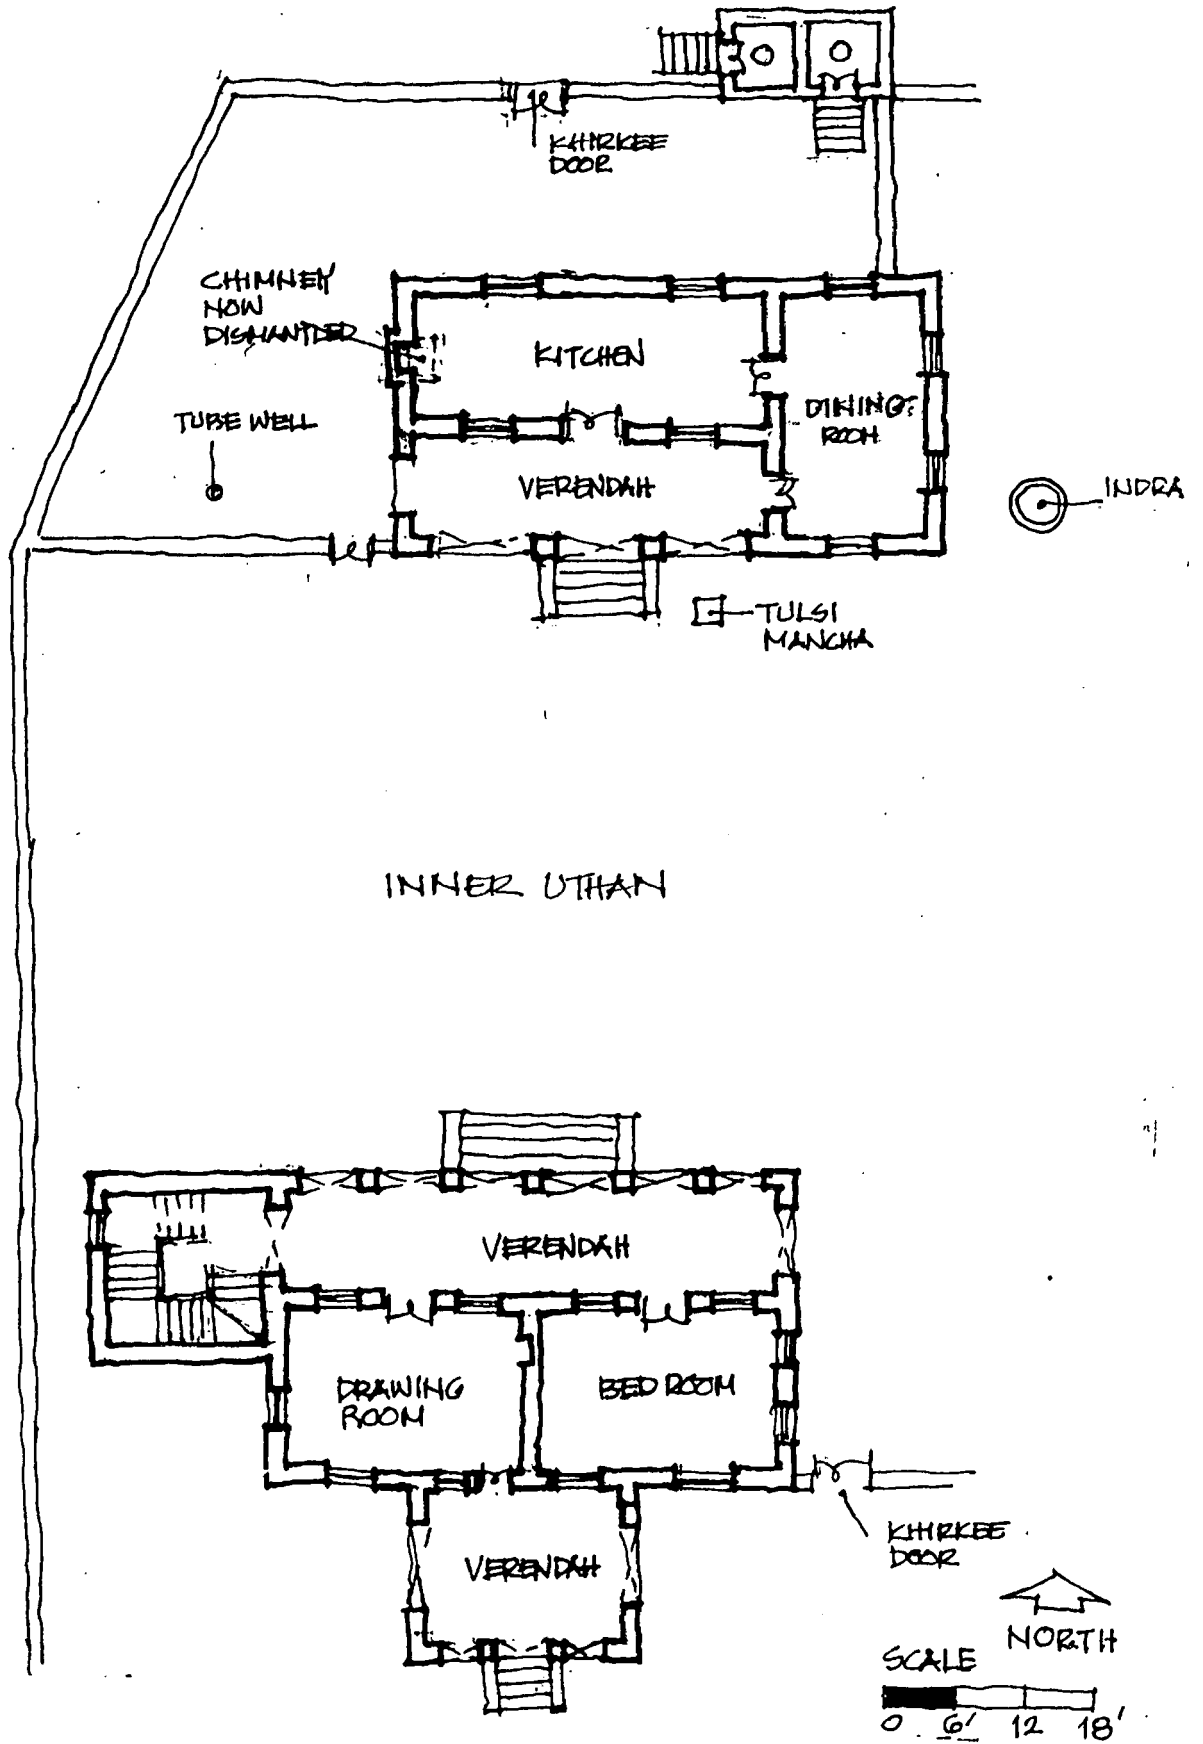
Ground floor plan house of Hemakanta at Ukil para Noagaon
